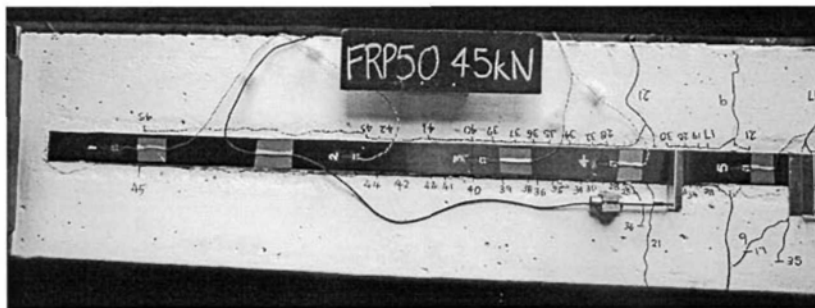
IC debonding crack propagation to uncracked anchorage zone
